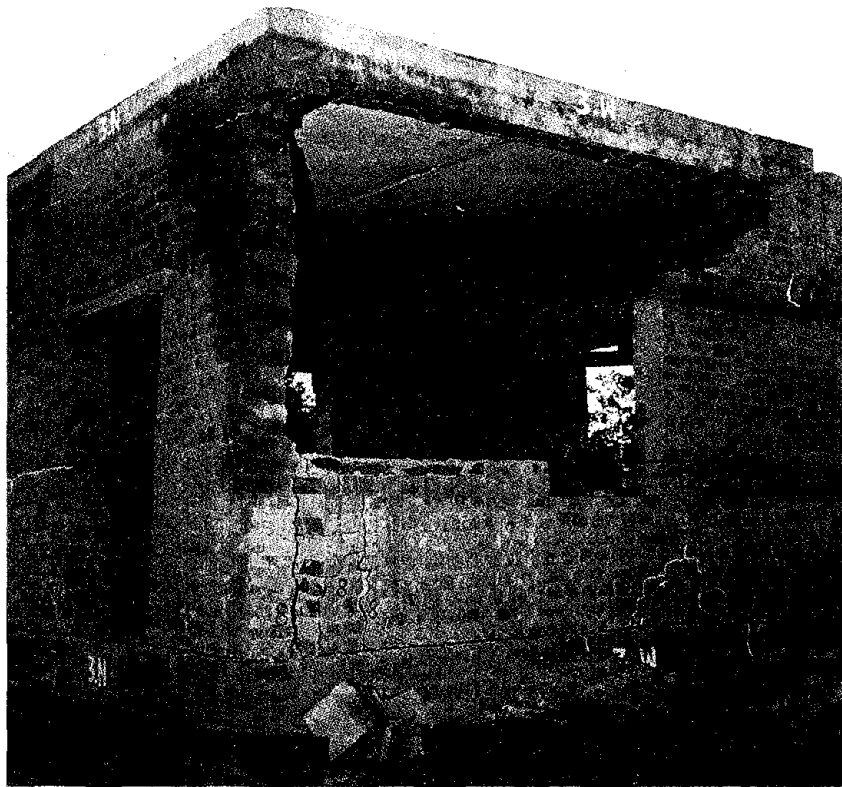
Unreinforced Cement Mortar, Transverse Wall
